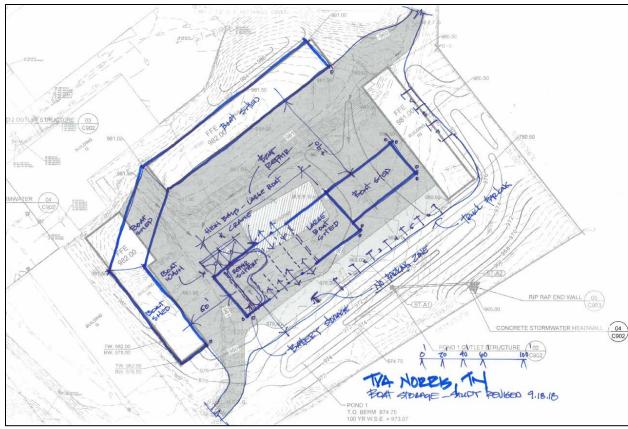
Proposed boat shed configuration (Option B) showing the demolition of Building I and the construction of a large curved/L-shaped shed to the northwest and southwest of Building I and a combined shop and shed in place of Building I.
